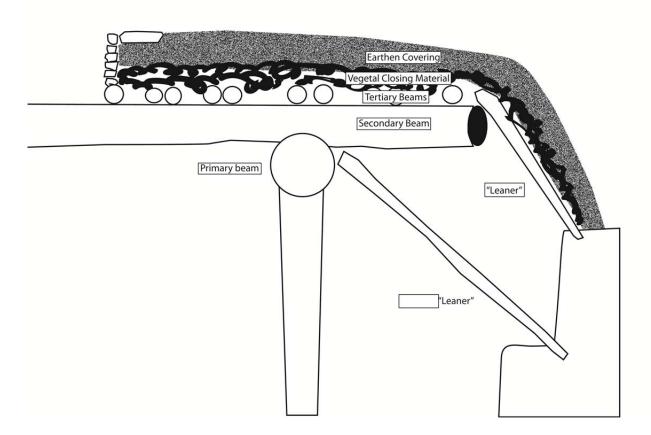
Pit House Roof Construction. Adapated from Wilshusen (1988:fig 18.8).
